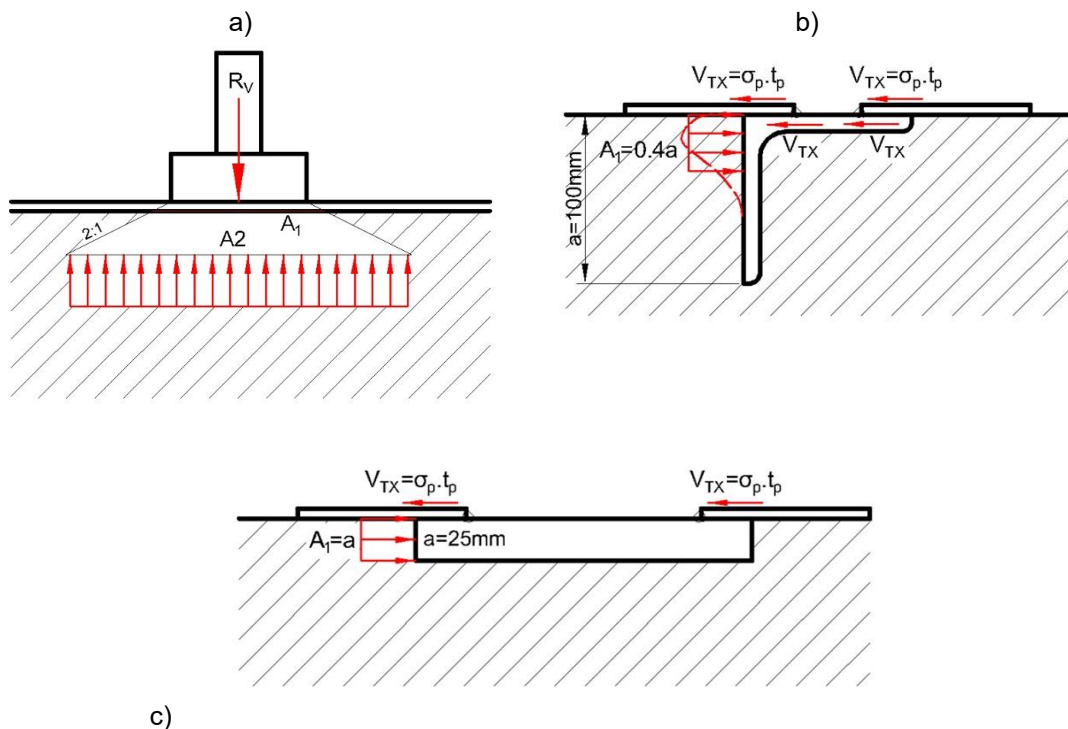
Liner components failure modes – a) Concrete crushing due to rack rocking (FM2, FM5); b) Embedded angle weld failure (FM9) and concrete crushing (FM10); c) Anchor plates bearing failure (FM7) and weld failure (FM8)
